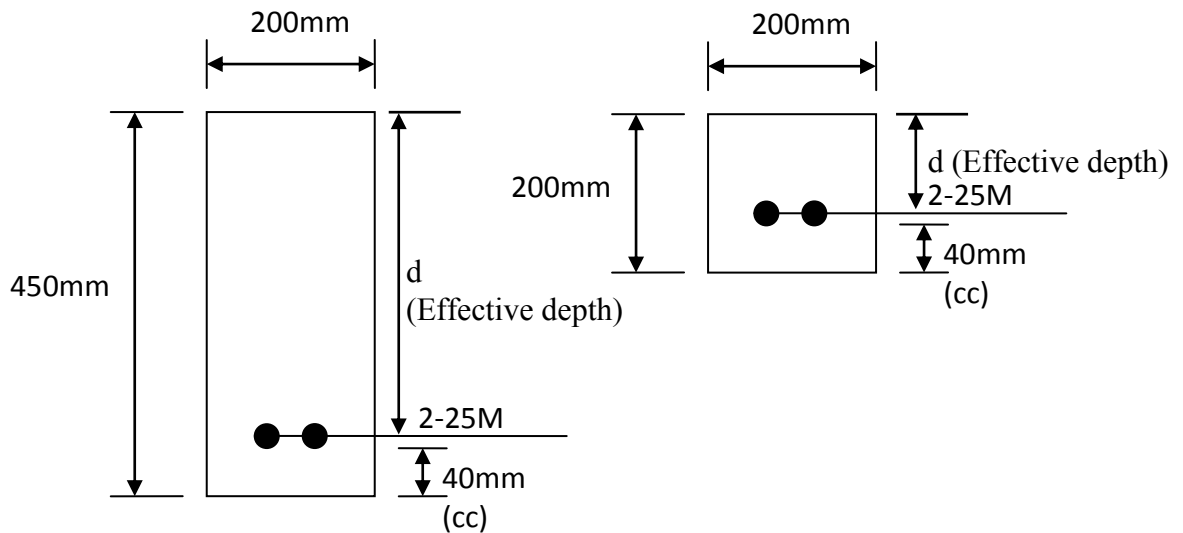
Left: RB1's cross-sectional area at the location of failure
